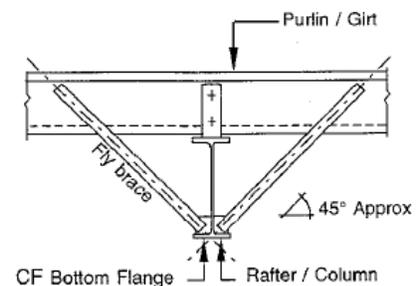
Roof Rafter Flybrace Detail (Clifton, 1997)
